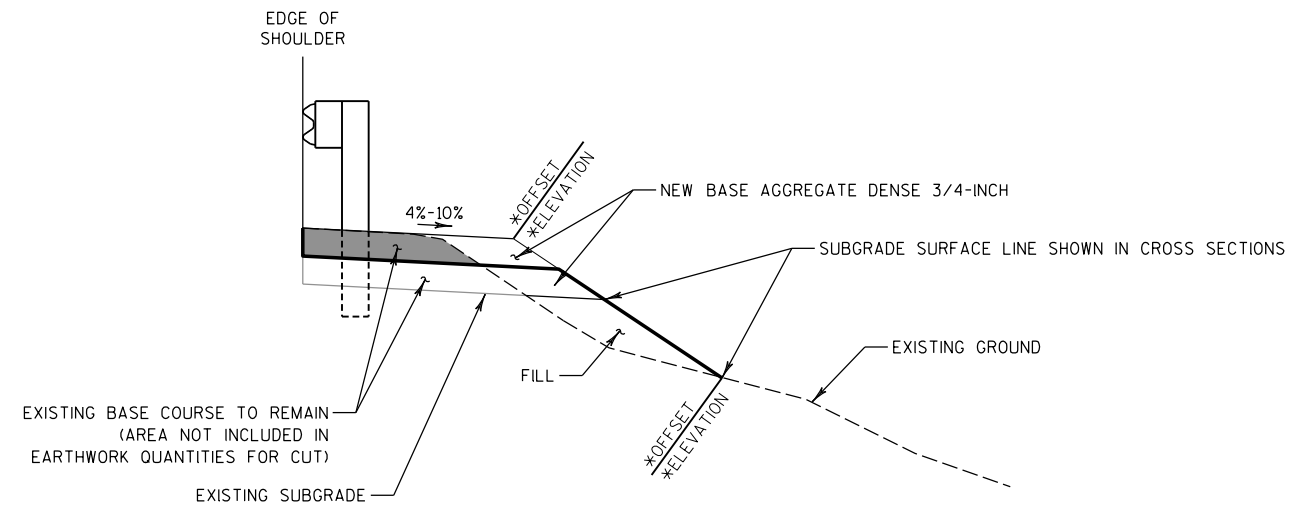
DETAIL FOR HMA SHOULDER AT GUARDRAIL
